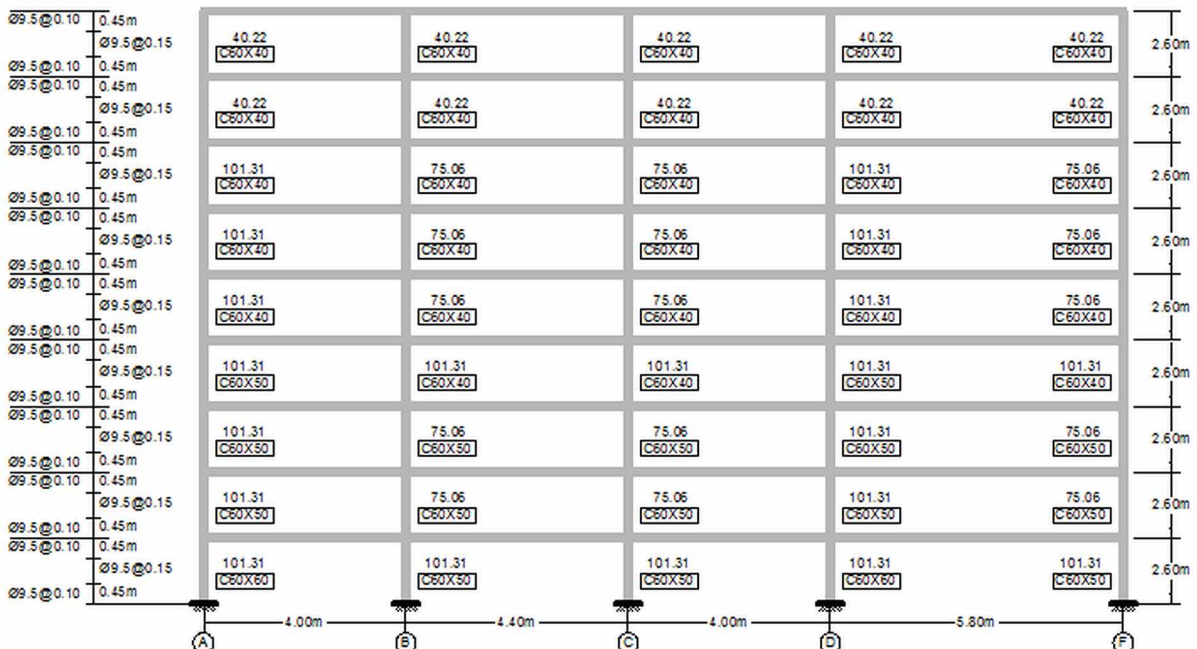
Residential building, geometry and reinforcement in beams of the frame 6
